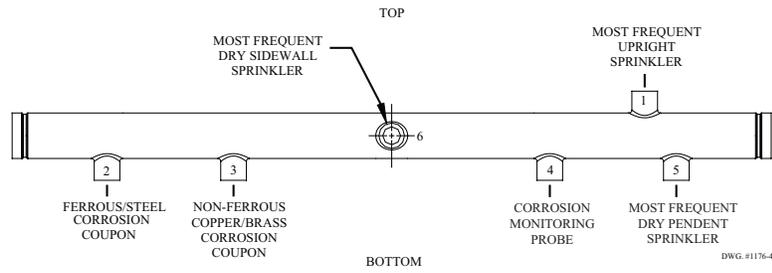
Corrosion Coupon Installation Diagram Riser Mount (RM)
